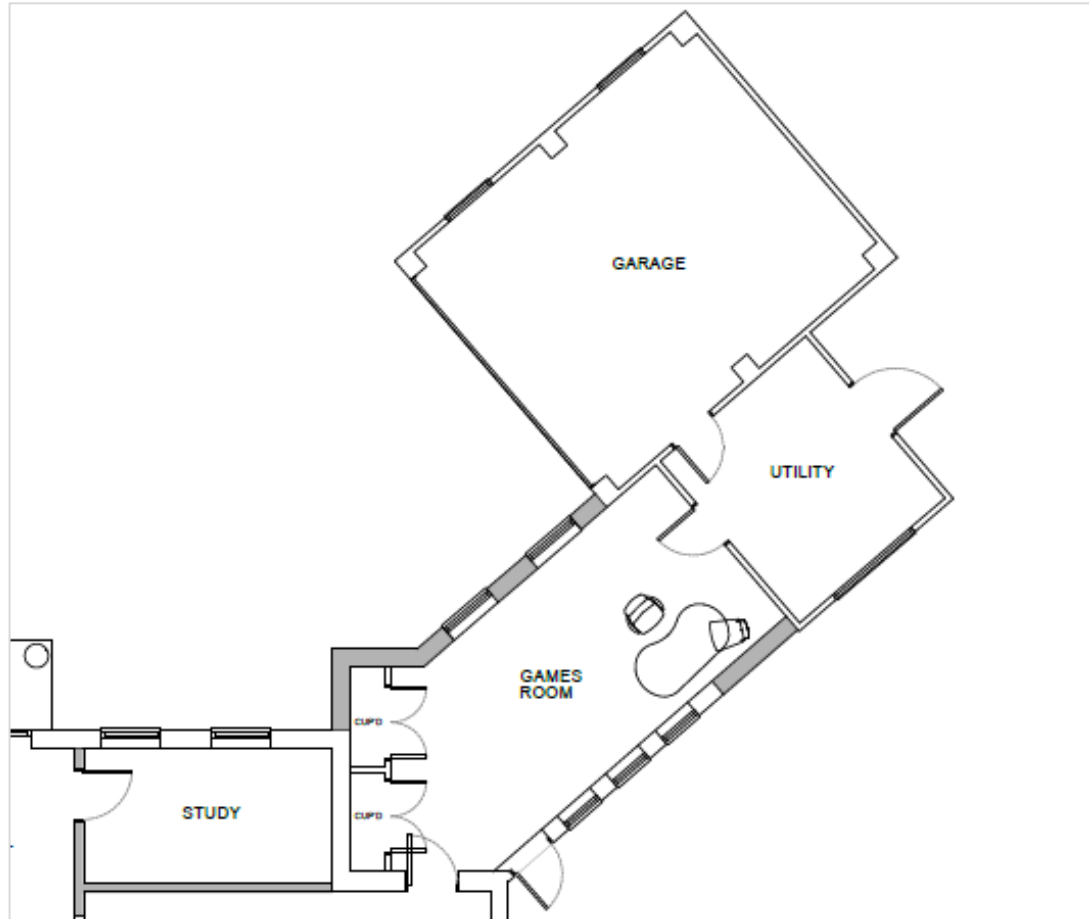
PROPOSED LINK EXTENSION (DRAWING NO. BDS-DB-P02)
